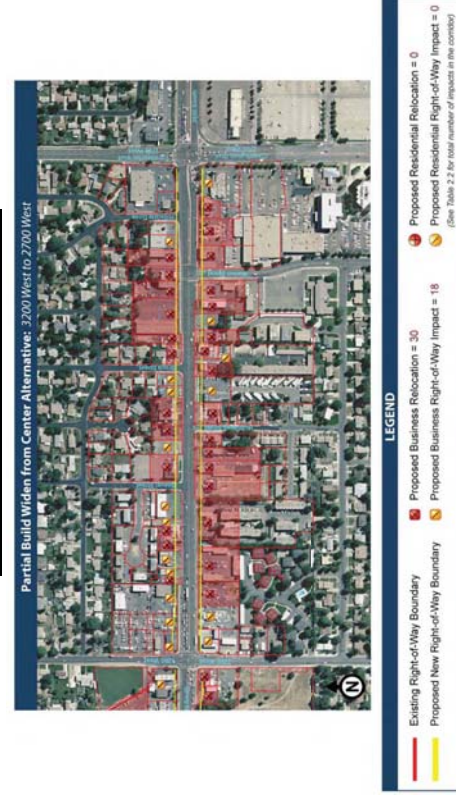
Partial Build Widen from CENTER Alternative: section 2
